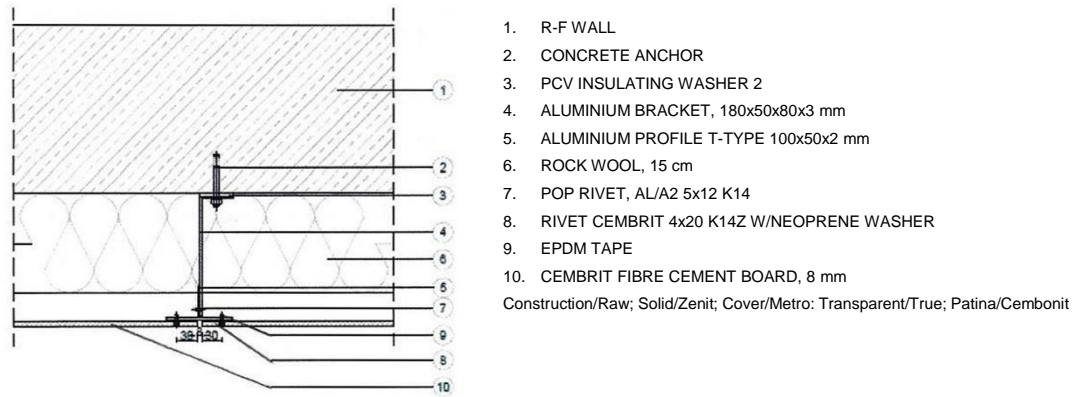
Fragment of a horizontal section of Cembrit cladding — example
